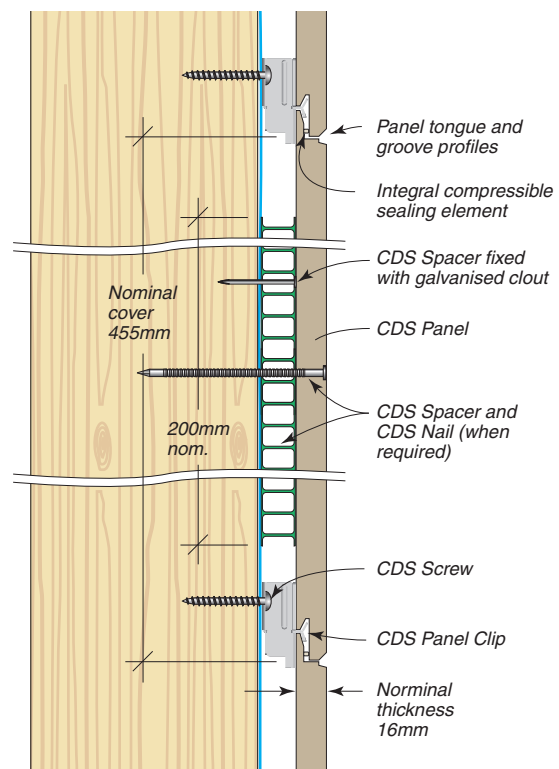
Typical CDS System Cross Section – ElevationTable 3: CDS Panel Height Coverage Calculator
